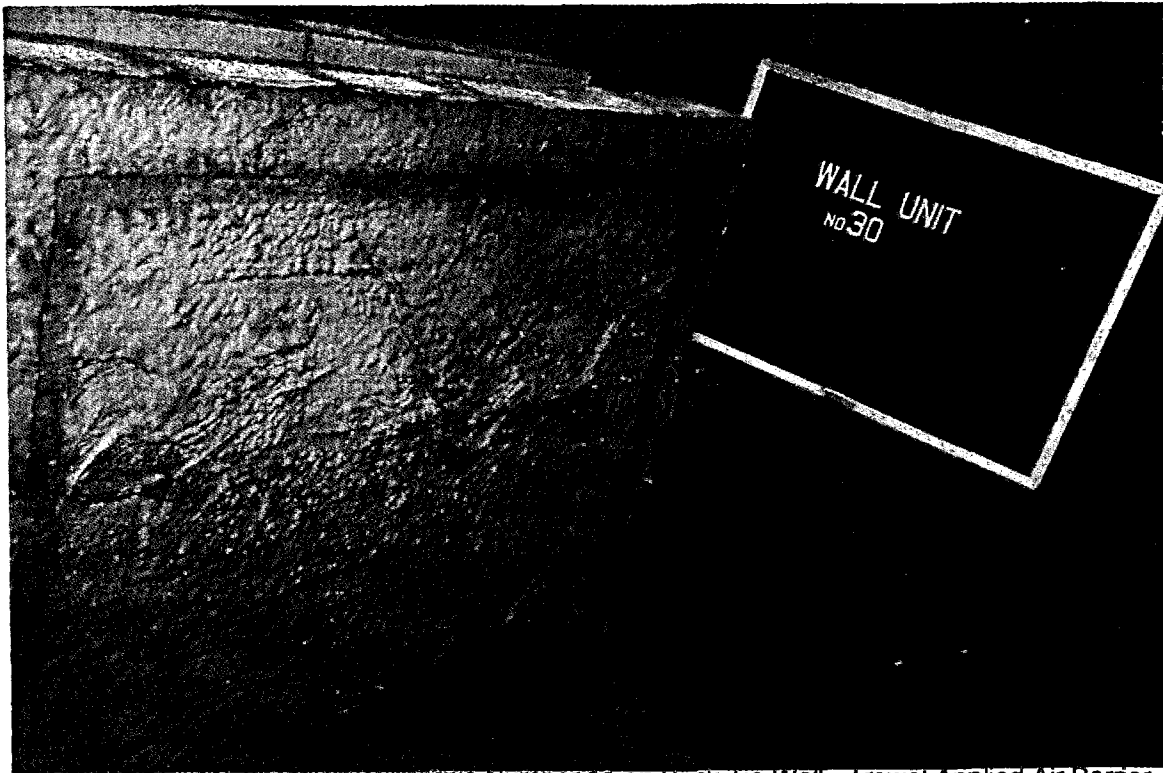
Post Test view of Sample Number 11 on Brick Tie Wall - Trowel Applied Air Barrier
